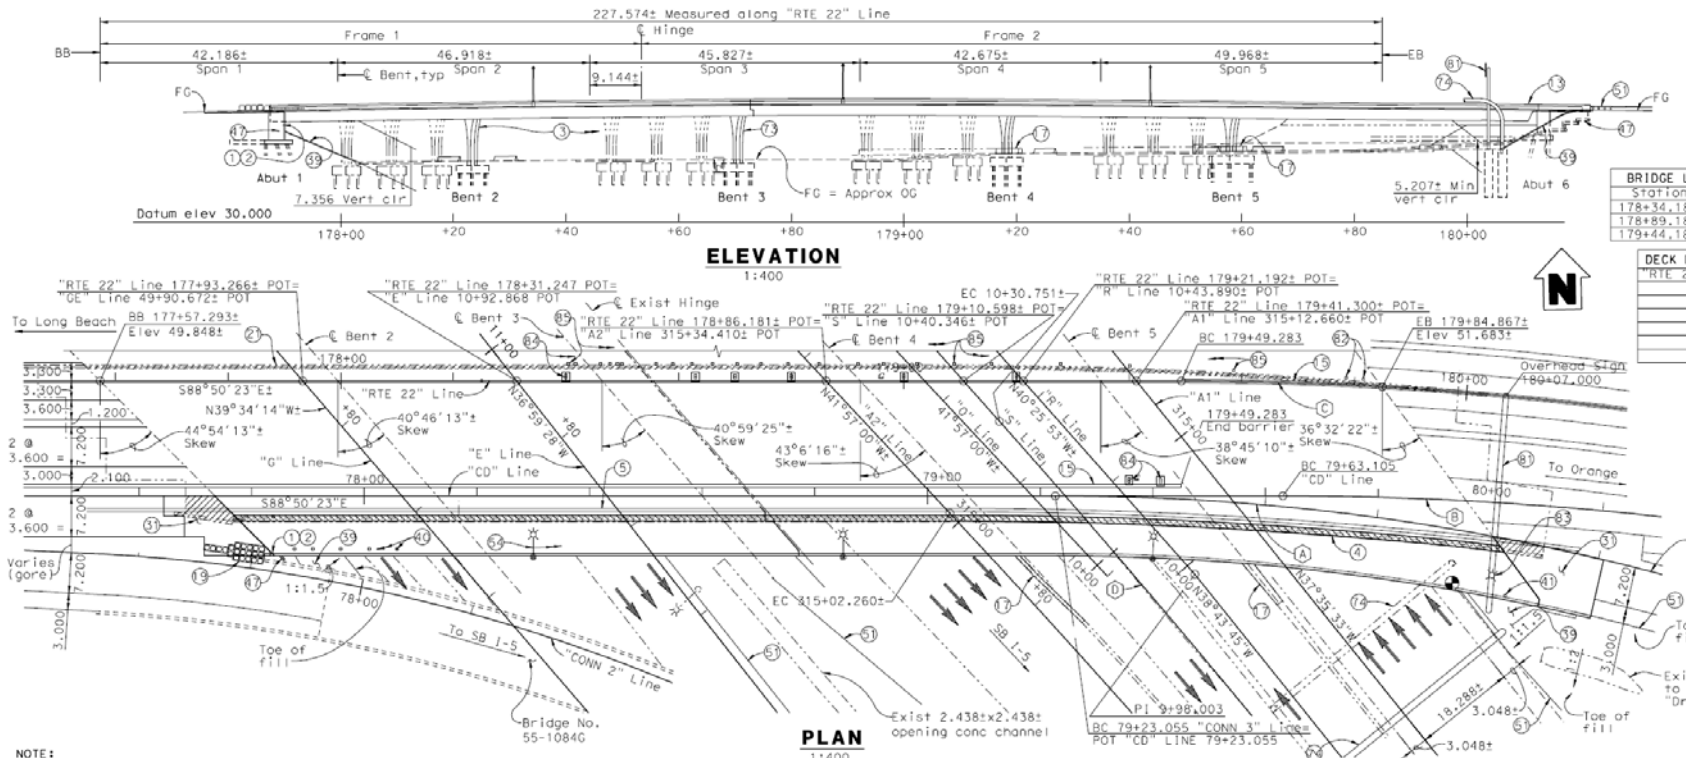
General plan and elevation of the SR-22/I-5 Separation Widening.
